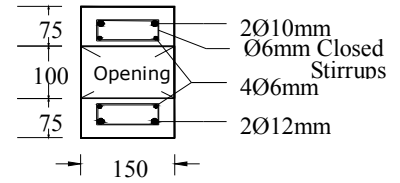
Internal Strengthening of Arches B8(90-S) and B10(45-S) (Section Through Opening)
